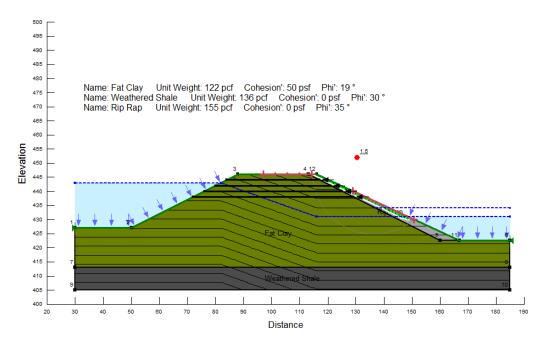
ALTERNATIVE 2 - 2H:1V REINFORCED SLOPE - WITH RIPRAP
